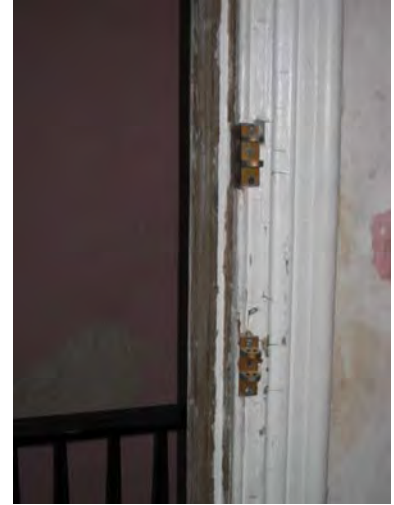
Door D305 frame damage. (Photo: BBB, 2007)
